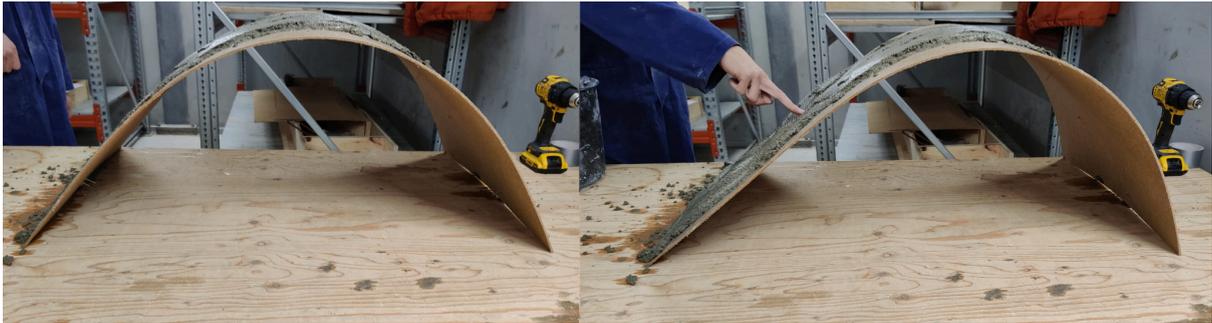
Testing of Heinz Isler's hanging fabrics
